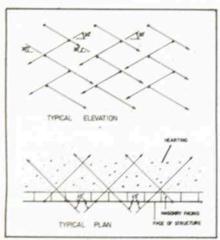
Arrangement of grout holes for Piers, Kincardine Viaduct
